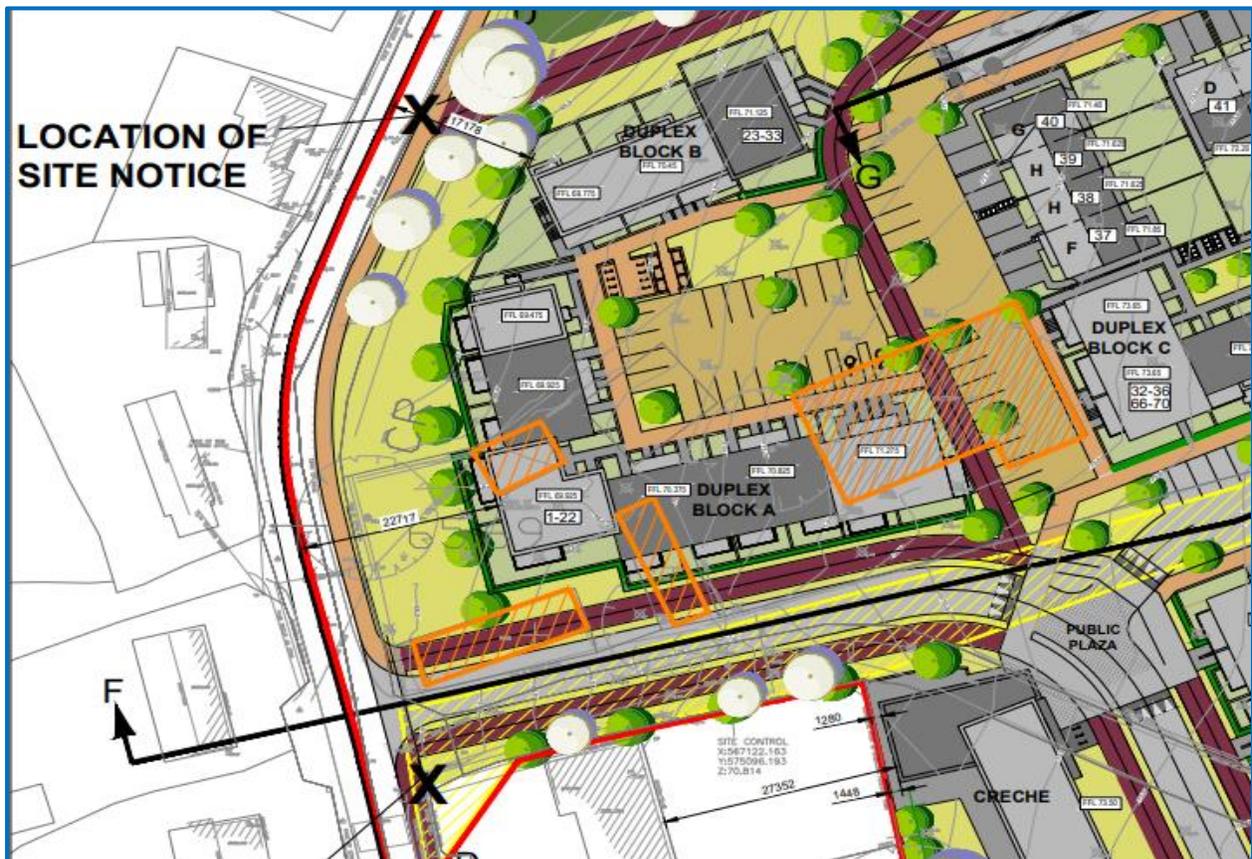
Proposed location of three-story duplexes and effect on existing dwellings on the Old Whitechurch Road
